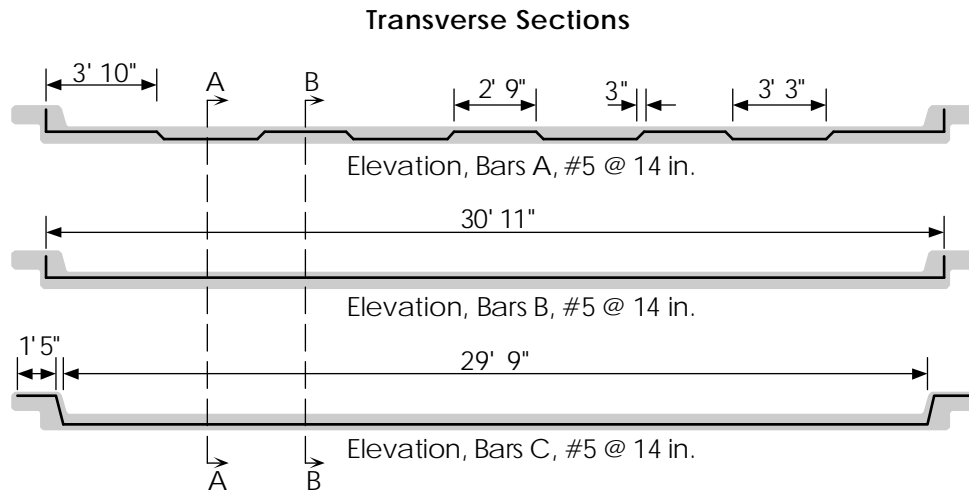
Details of the Main Transverse Reinforcement in the Concrete Bridge Deck
